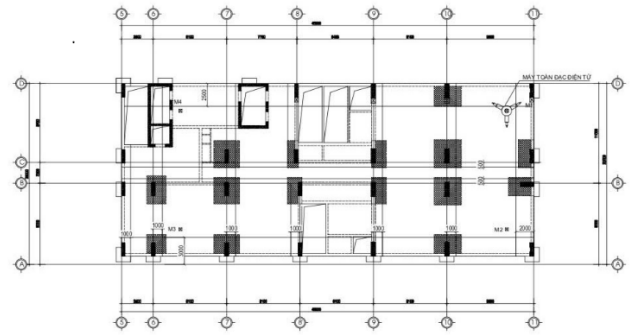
Layout Plan for Column Head Positioning – Ngoc Xanh Hotel Project.
